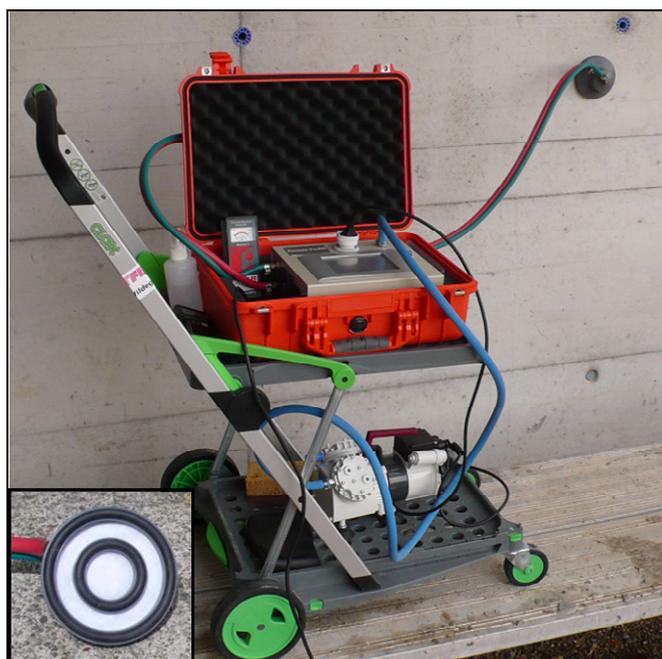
kT test: details of vacuum cell and application on a concrete wall
